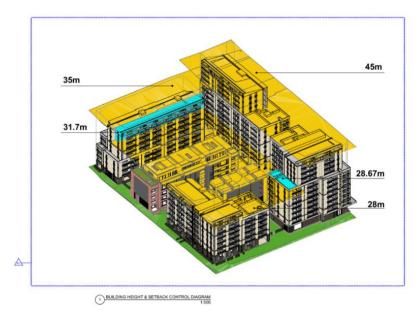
Axonometric Plan View of Proposed Building D1 and E3 – LEP Height Variation Coloured Blue (Source: Candalepas Associates and Lachlan Seegers Architects)
